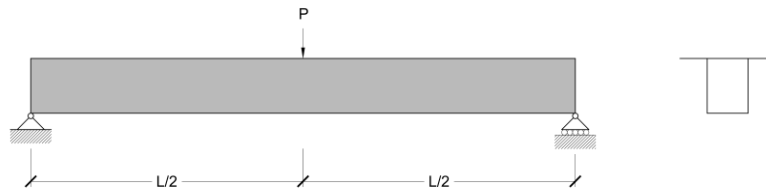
Example of a thin-walled box girder. Elevation (left) and cross section (right) views
